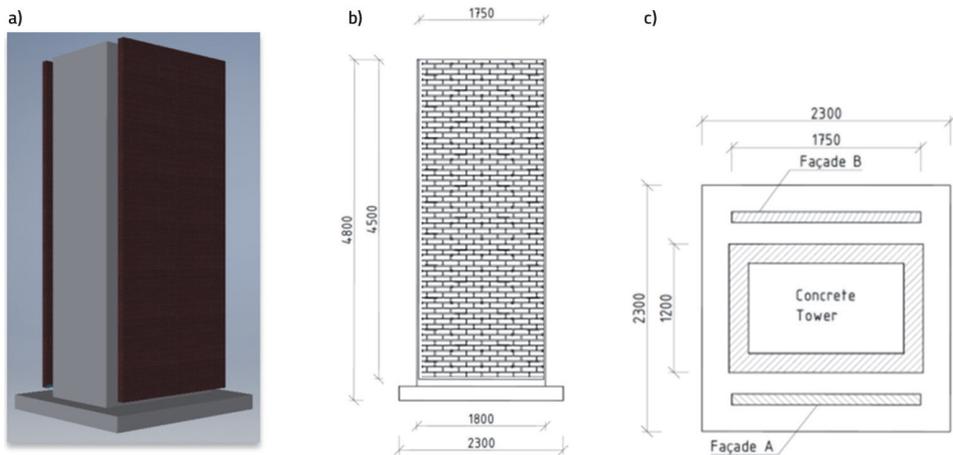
a) 3 D model of the test object; b) Elevation of the test object; c) Floor plan
